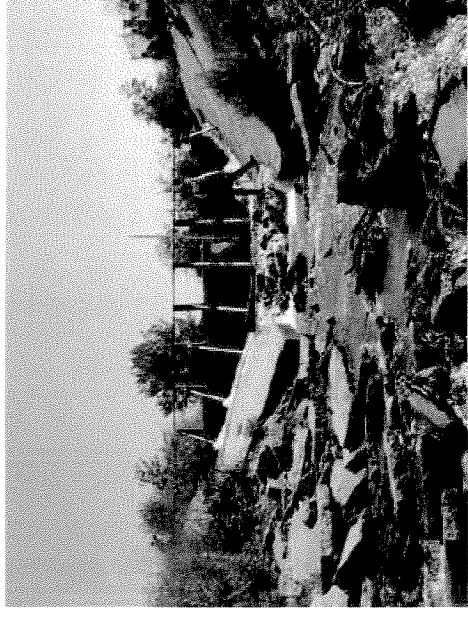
Downstream looking upstream at Cherryland Flashboard Dam
